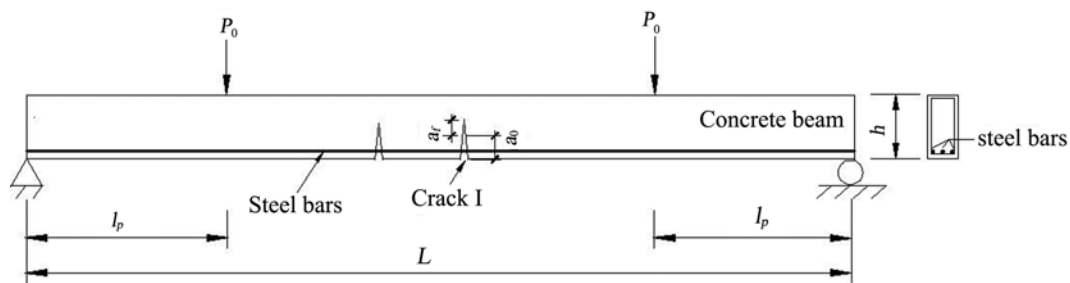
Layout of the Reinforced Concrete Beam with Distributed Cracks
